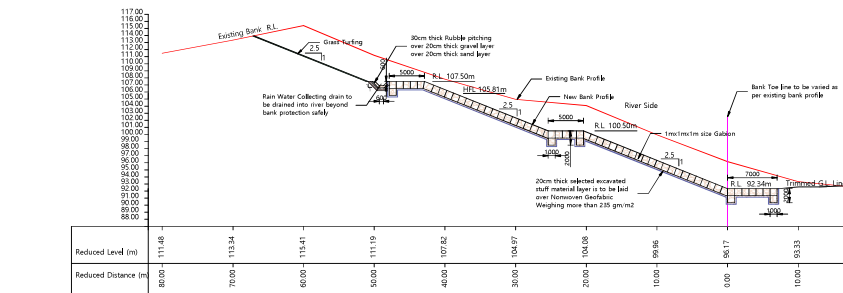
(D) TYPICAL CROSS SECTION OF HIRAPURA BARRAGE GUIDE BANK - U/S LHS @ CH. 360 m
